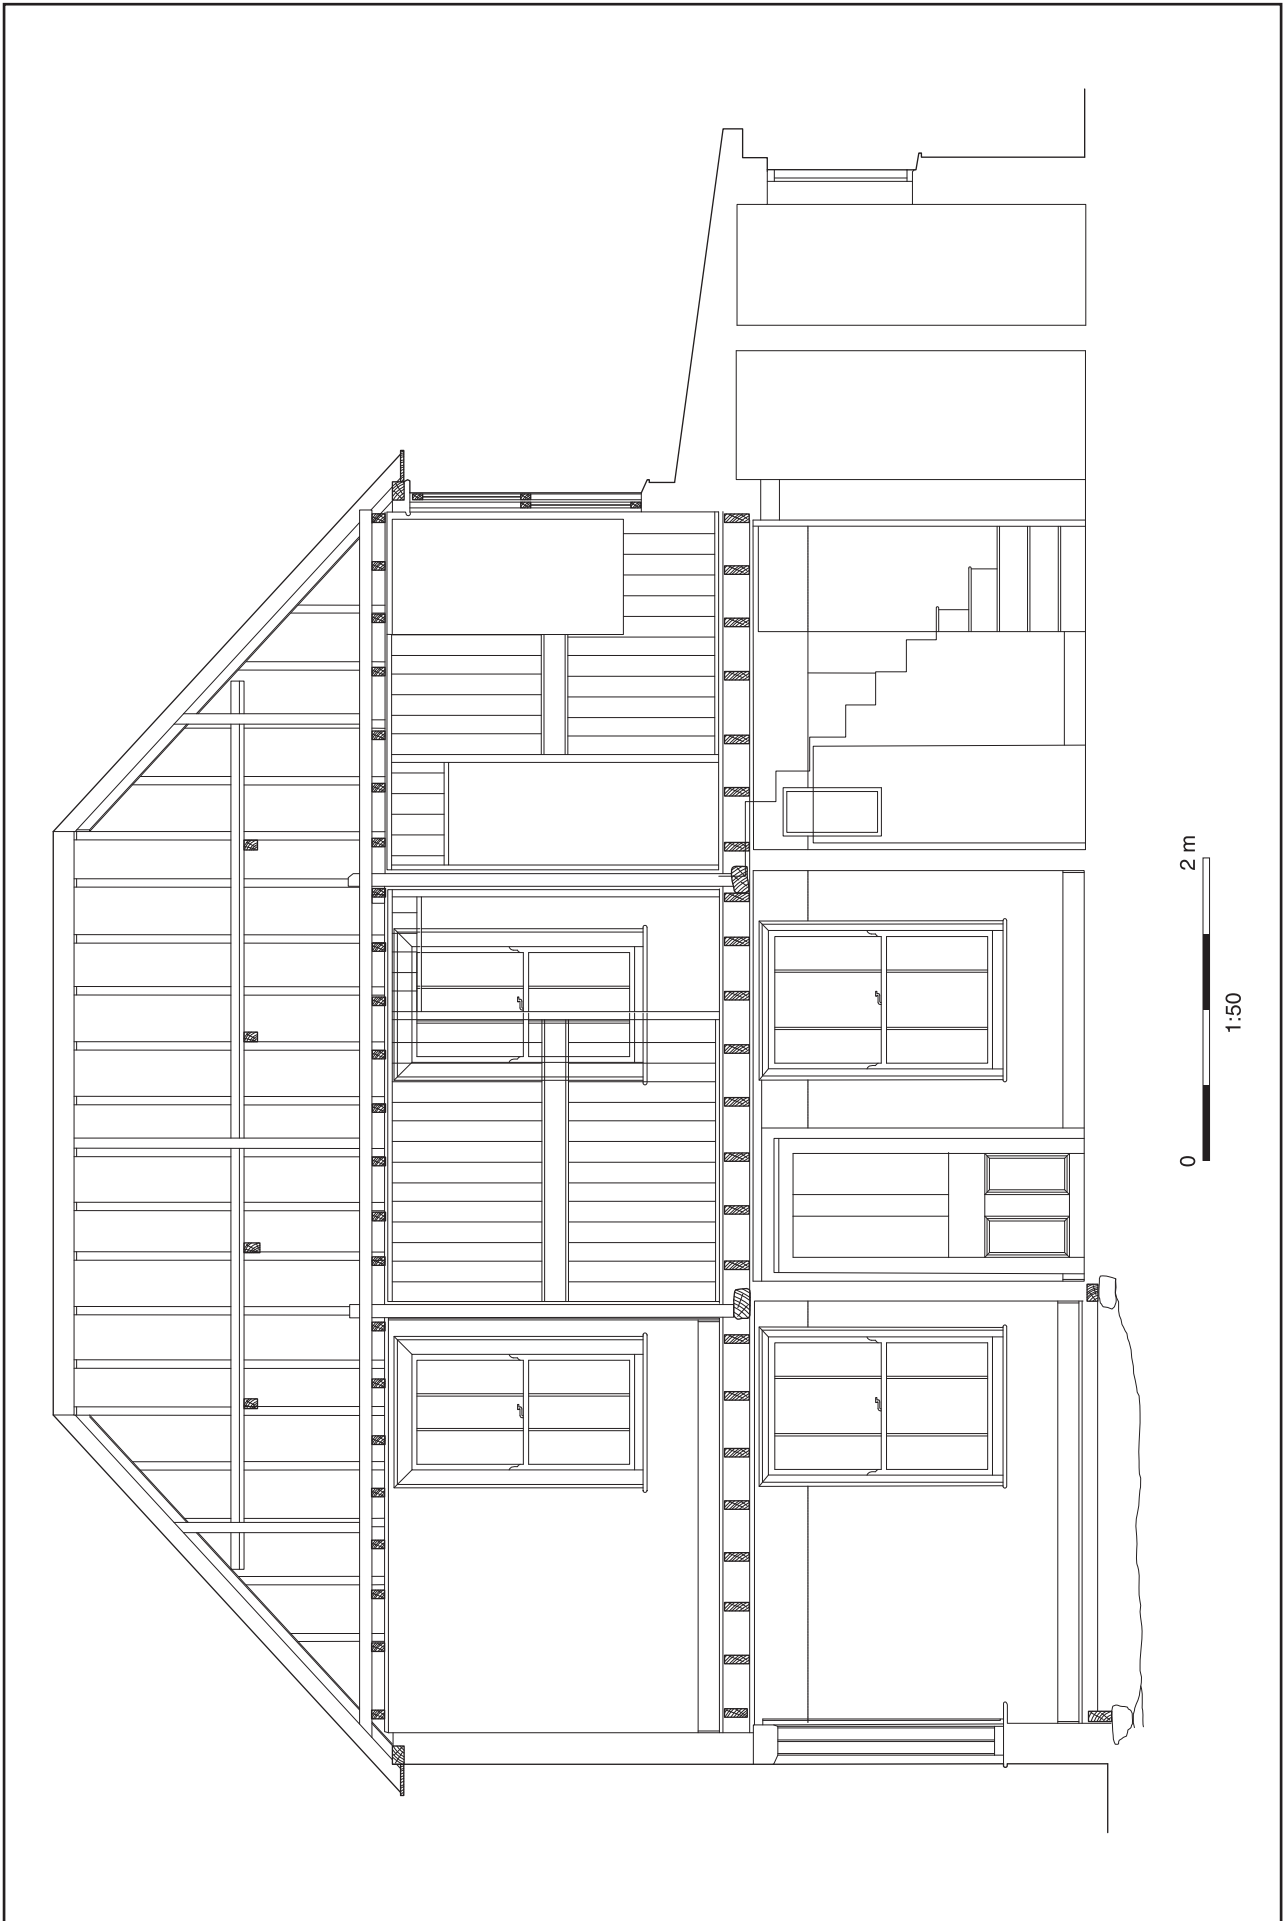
No. 4 Boys Hall Road: longitudinal section of building
